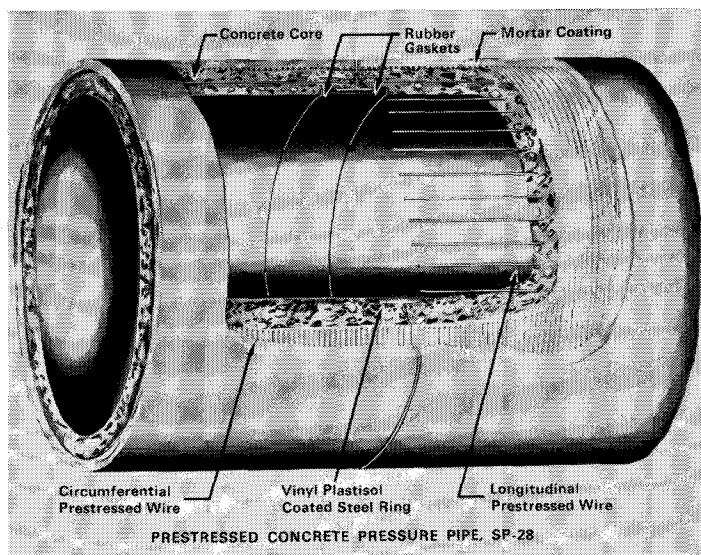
Prestressed Concrete Pressure Pipe with Double Rubber and Concrete Bell Joint
